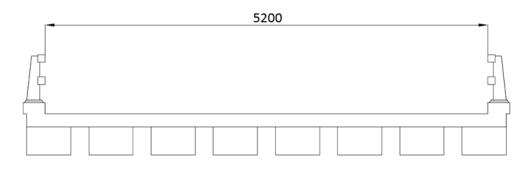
Typical Proposed Cross Section for Horsey Swamp Creek Bridge
